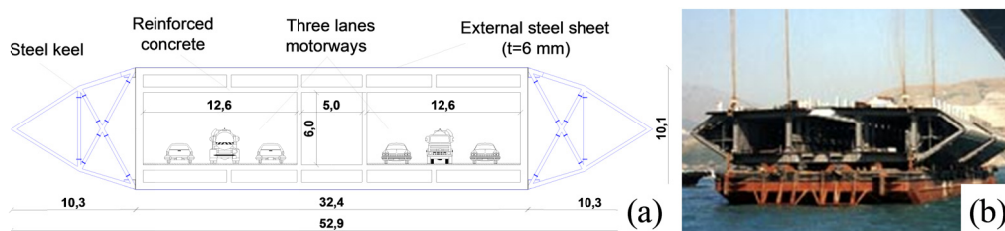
(a) SFT rectangular cross-section equipped with streamlined lateral steel keels; (b) segment of the Tsing Ma Bridge (Hong Kong) truss.
